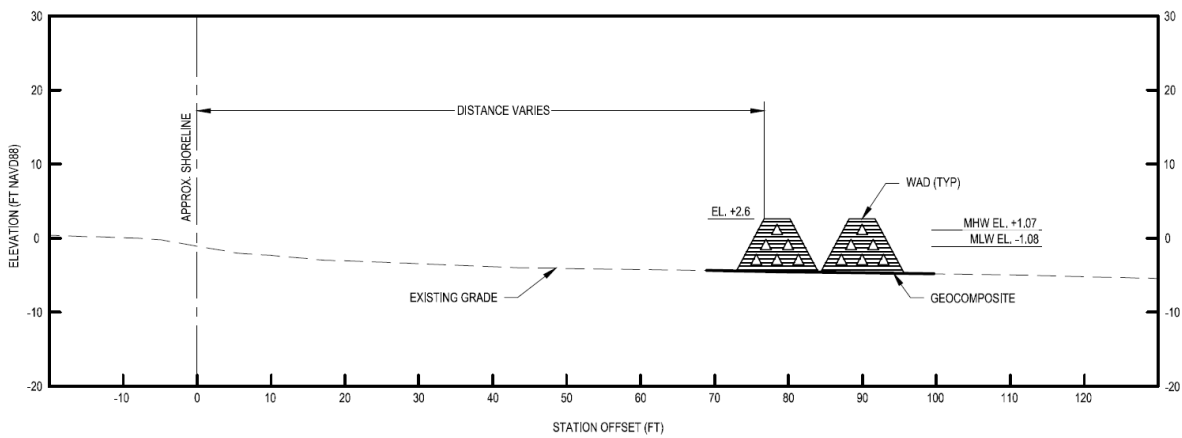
Typical Section of a Wave Attenuation Structure at Alignment A
